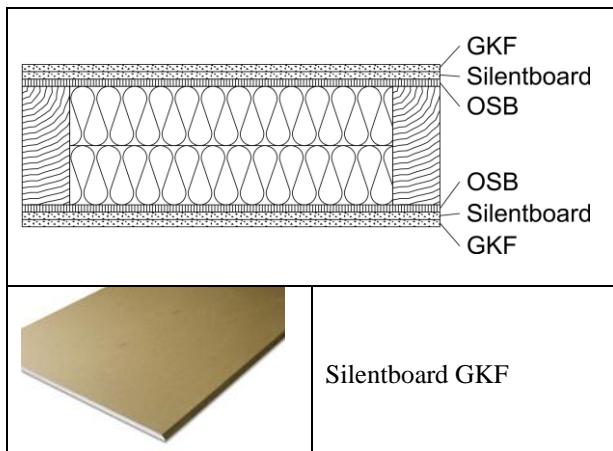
Timber stud wall with an additional layer “Silentboard GKF” [7], a gypsum board recommended for exceptional sound insulation in drywalling.
